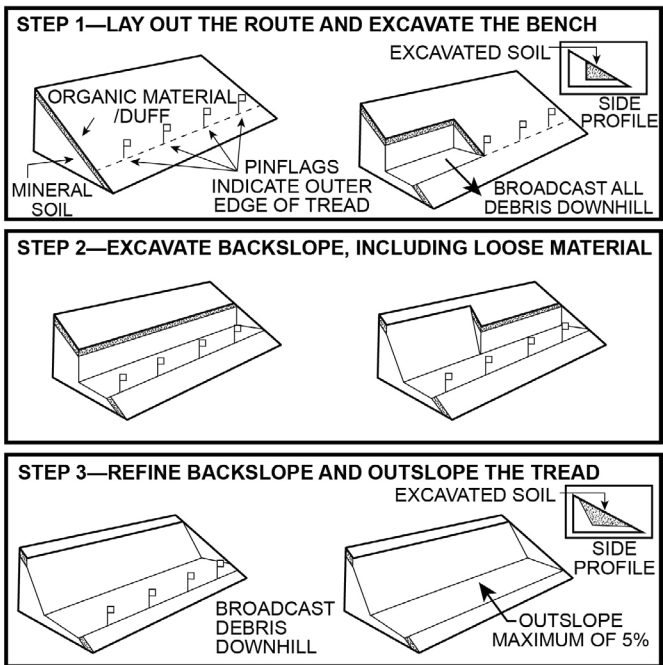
Steps to construct a sidehill trail by hand. Adapted from a drawing by the Appalachian Trail Conservancy.
